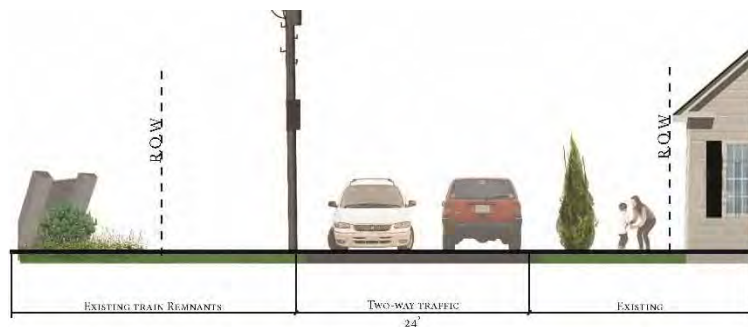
Existing Road R.O.W. looking east on Clement St.
